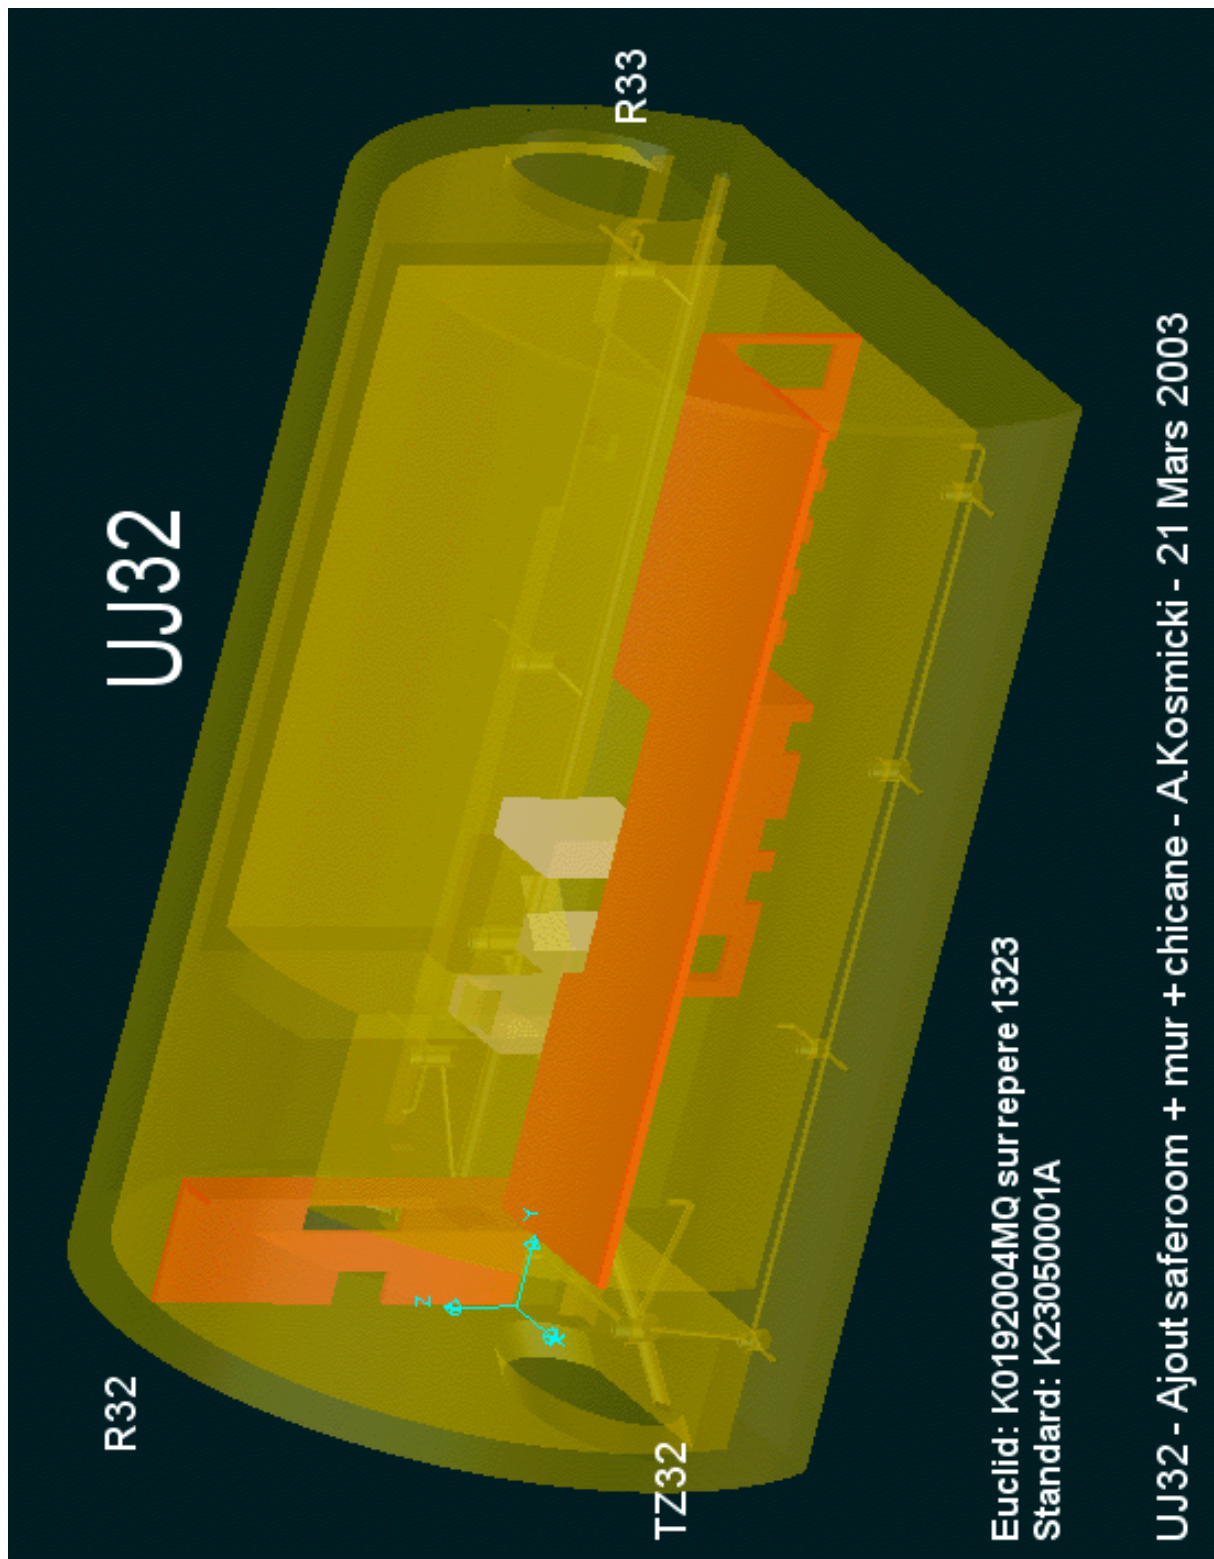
3D view of UJ32 showing original concrete structure (green), additional walls (orange) and shielding stacks (grey).
